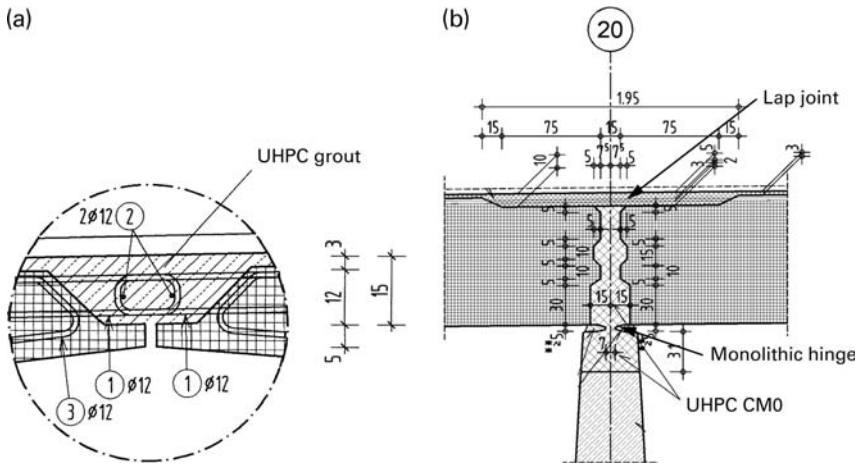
HLSV pilot project: a) longitudinal joint between two precast segments, b) lap joint and monolithic hinge at central support
